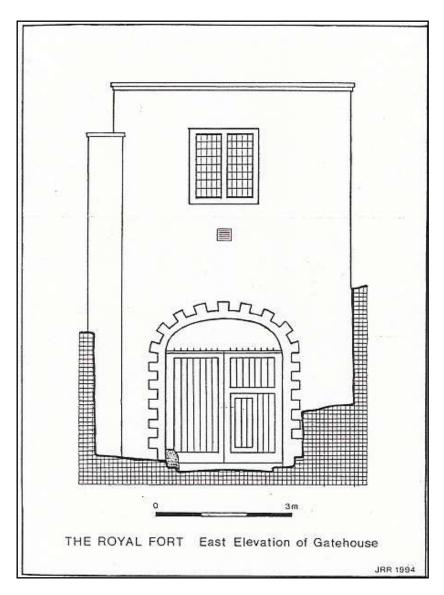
A plan of the modern Royal Fort gatehouse (Russell 1995, 21).
